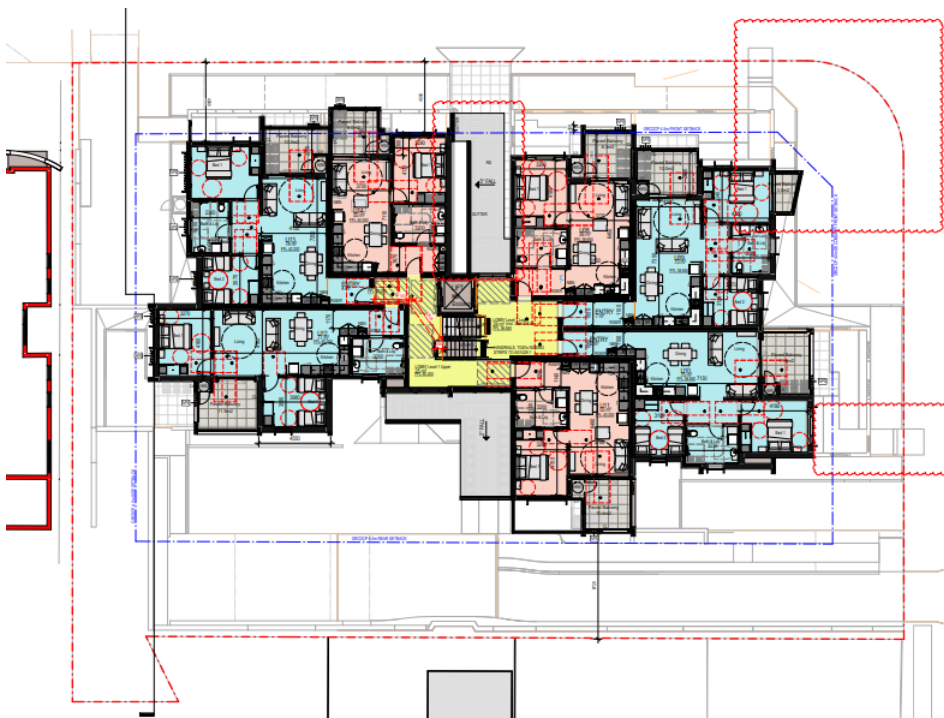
Extract from Architectural Plans – First Level (Source: Architectural Plans, SARM Architects, dated 20/10/2023)
